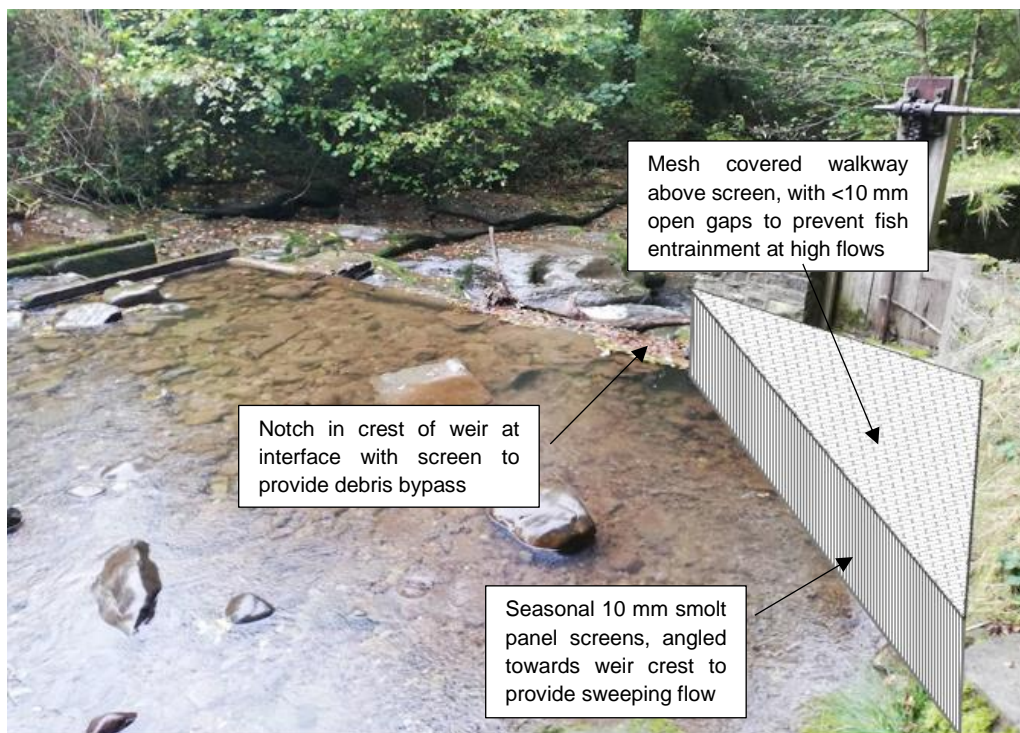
Suggested intake screening arrangement for the Cwm Crawn site.
